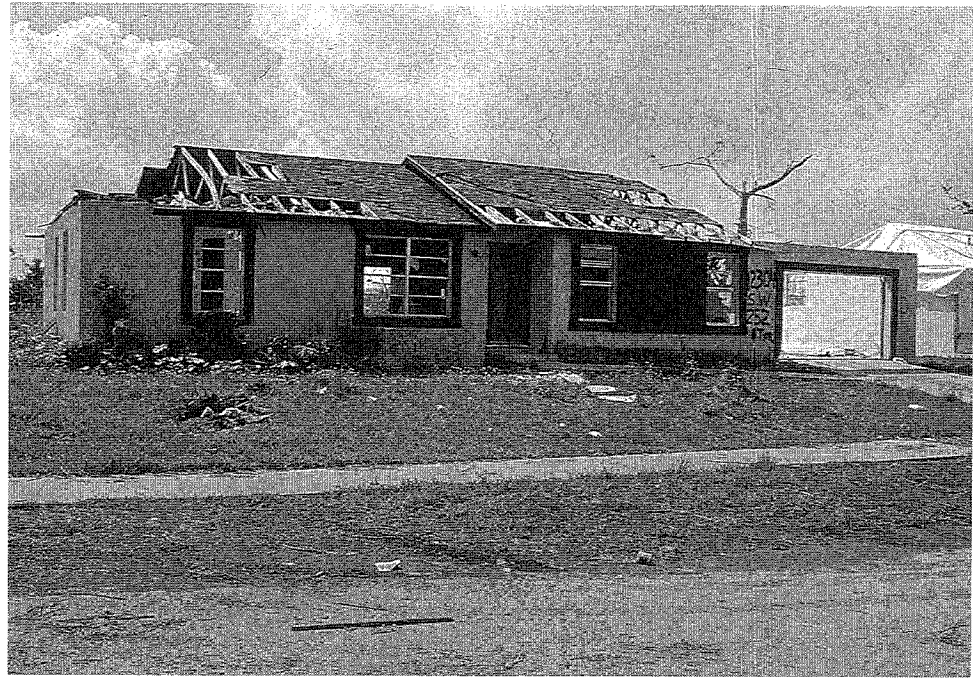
Wind-damaged home with over two-thirds (Level 3) rating for the overall building condition. Both gable ends are destroyed, the roof over the garage is gone, many pieces of sheathing are missing, and all doors and windows were severely damaged.
